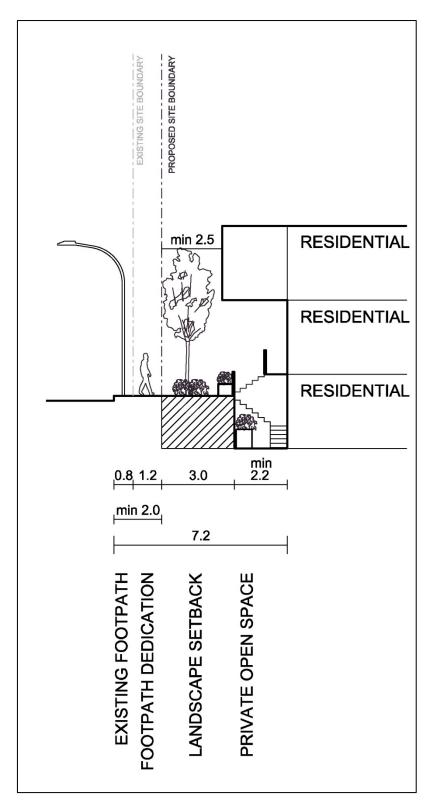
xx: Section E 904 Bourke Street, Zetland – Typical ground floor condition for McPherson Lane South
